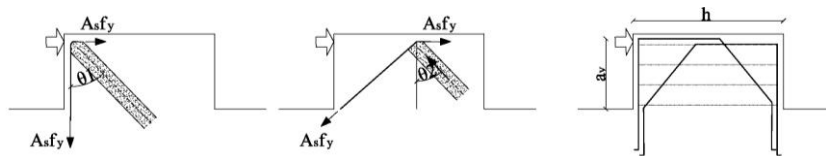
Features of short corbels with an arrangement of inclined reinforcement bars
